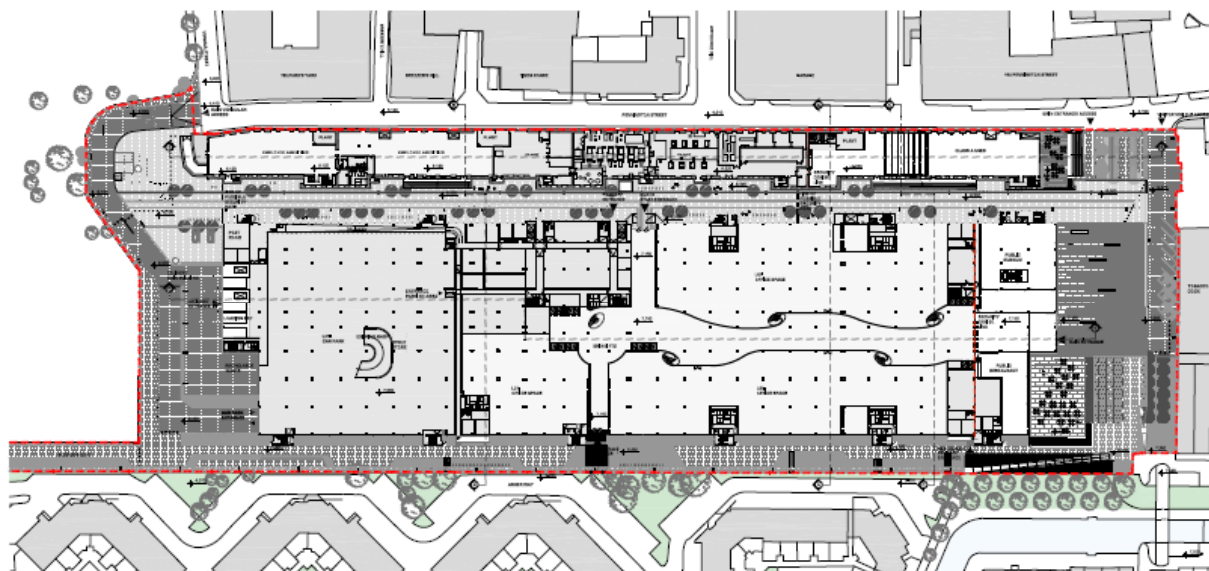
Proposed ground floor layout. Source: Design & Access Statement, April 2009.
